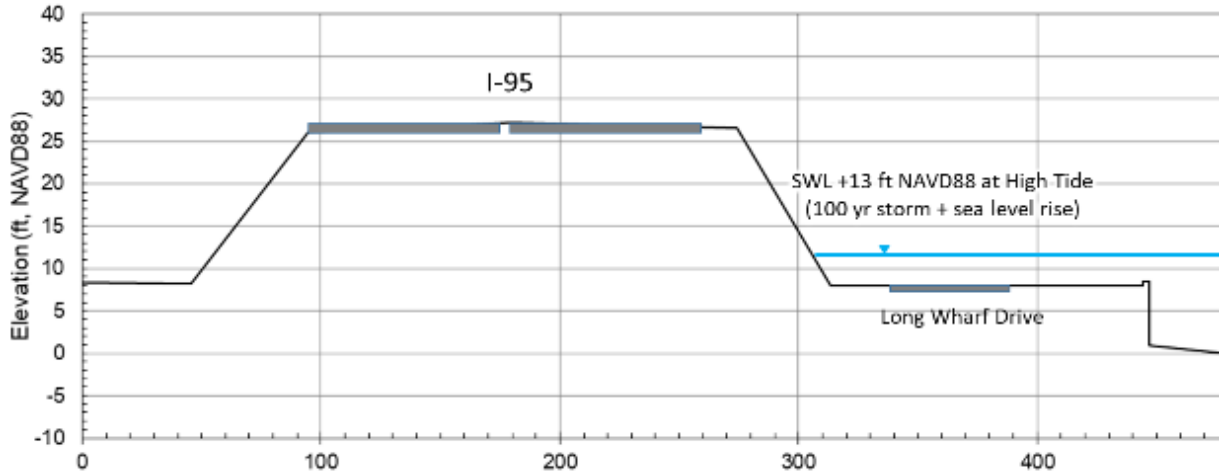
Cross section of I-95 embankment near Long Wharf Drive Underpass (see Figure 5 for location)
